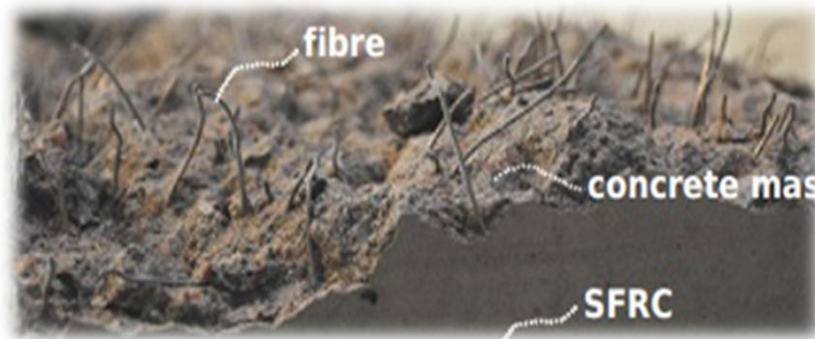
STEEL FIBRE REINFORCED CONCRETE
